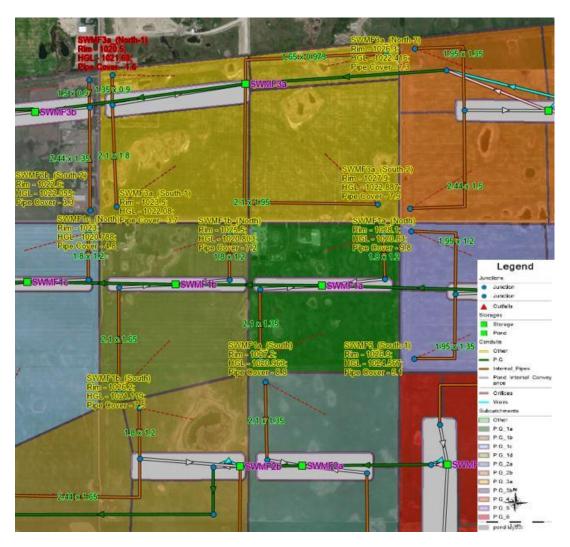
SWMF Outlet Pipes and Associated Ground Cover (Layout Section-2)
